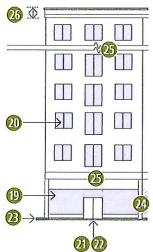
D. Downtown Storefront: Facade Requirements
